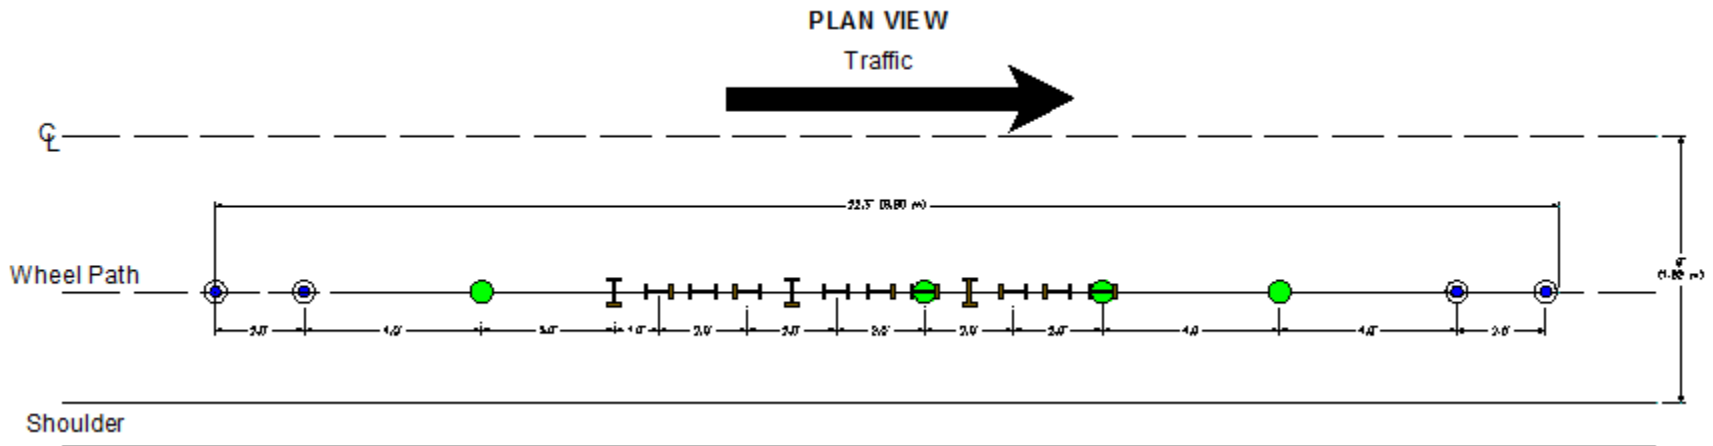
Illustration. Plan view of pavement structure and instrumentation of Sections A and B (13-in-thick).
